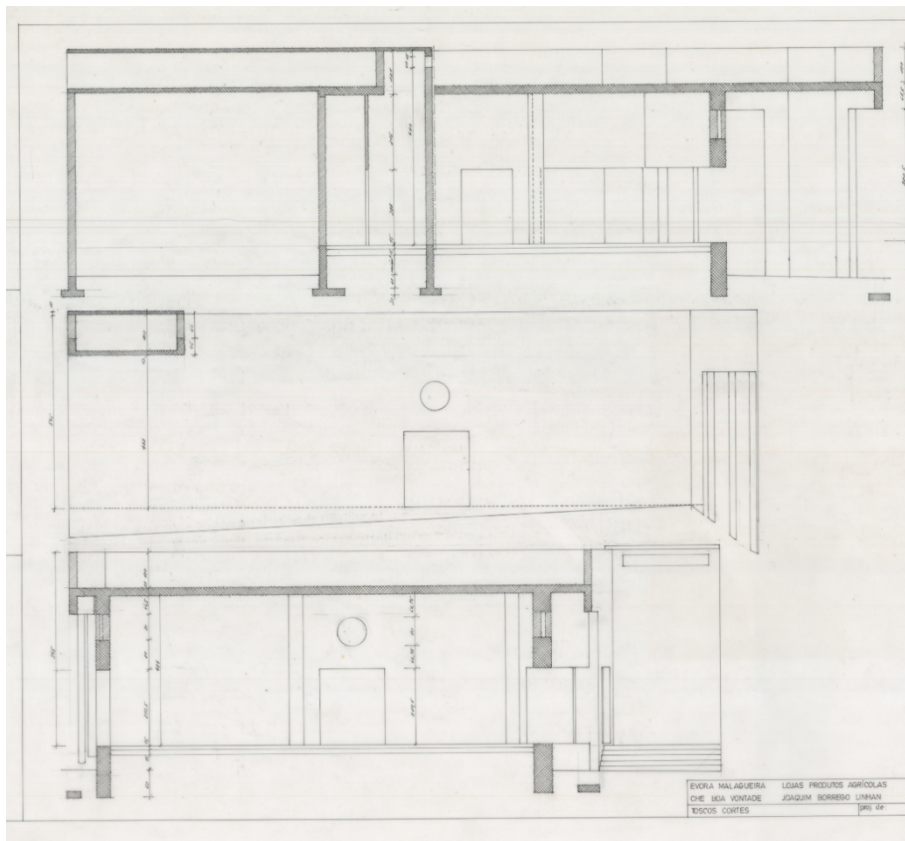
, conduct section, building side view and transversal section, by: drawing matter.
